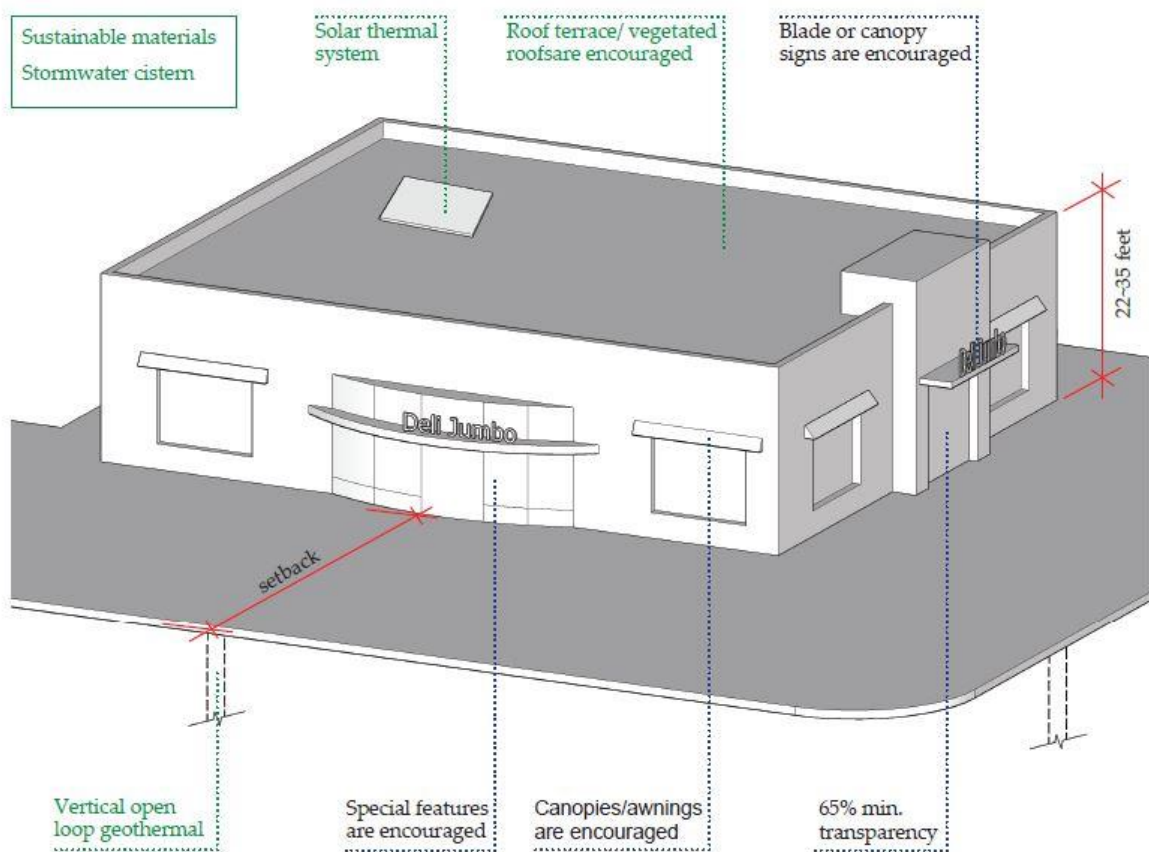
Retail buildout example, source: (EDAW Inc., 2009)
